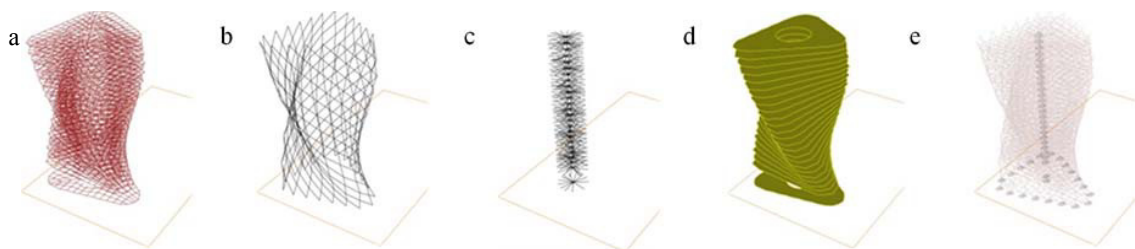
Structure System (a) beam structure; (b) diagrid enclosure; (c) core structure; (d) floor slab structure; (e) supporting structure
